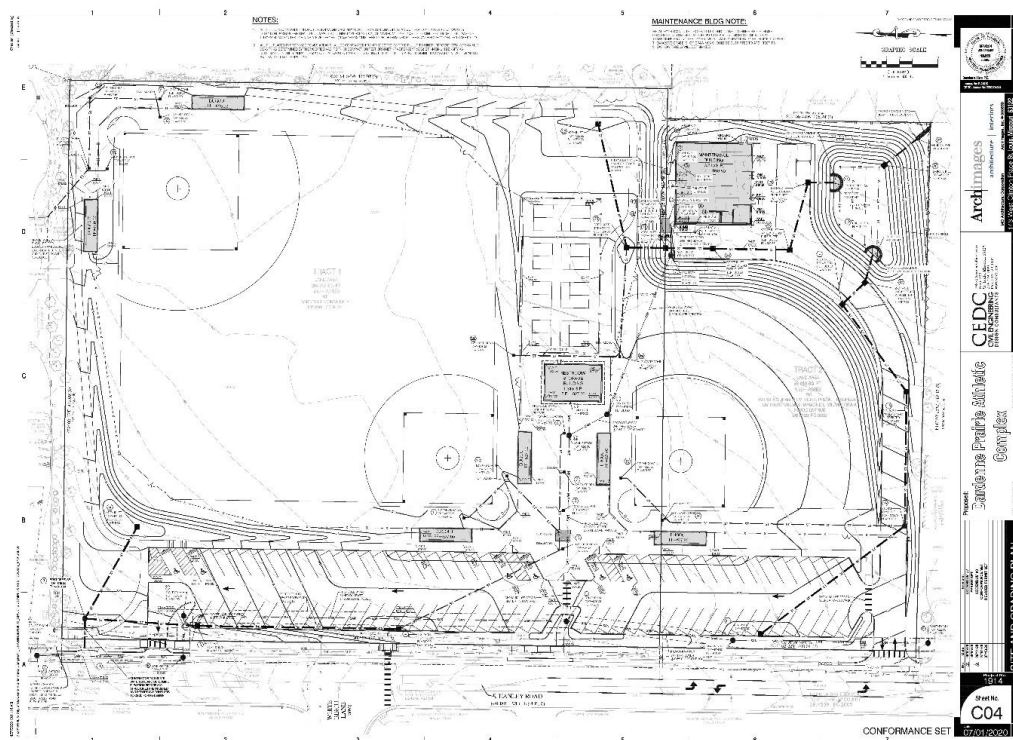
Maintenance Shed site plan/grading plan reference. The City should retain the full-size plan separately if needed for facility inspections.
